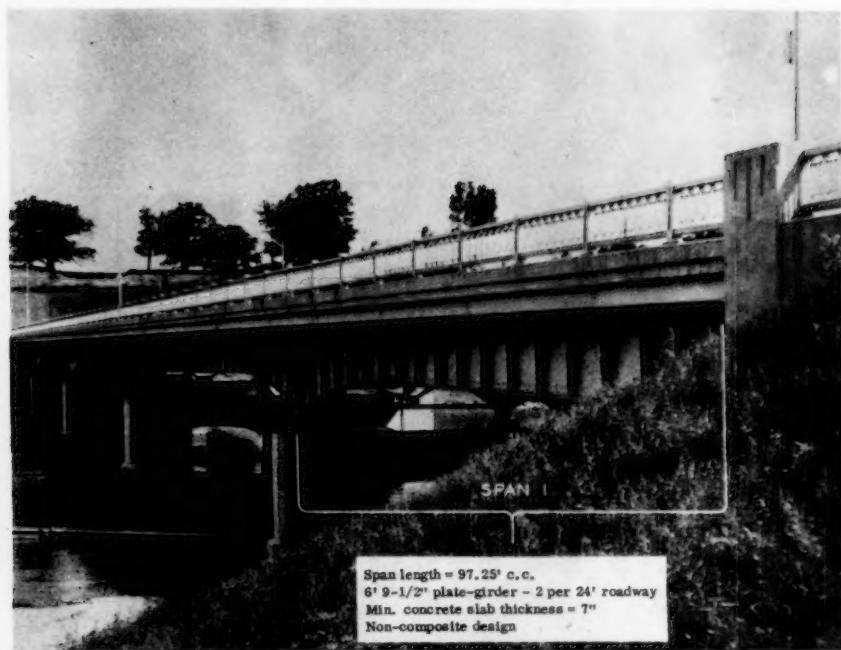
Bridge B1 of 62-12-1. On routes M-37 and M-82 in Newaygo. Five-span plate girder cantilever-type bridge with floor beams and stringers.
